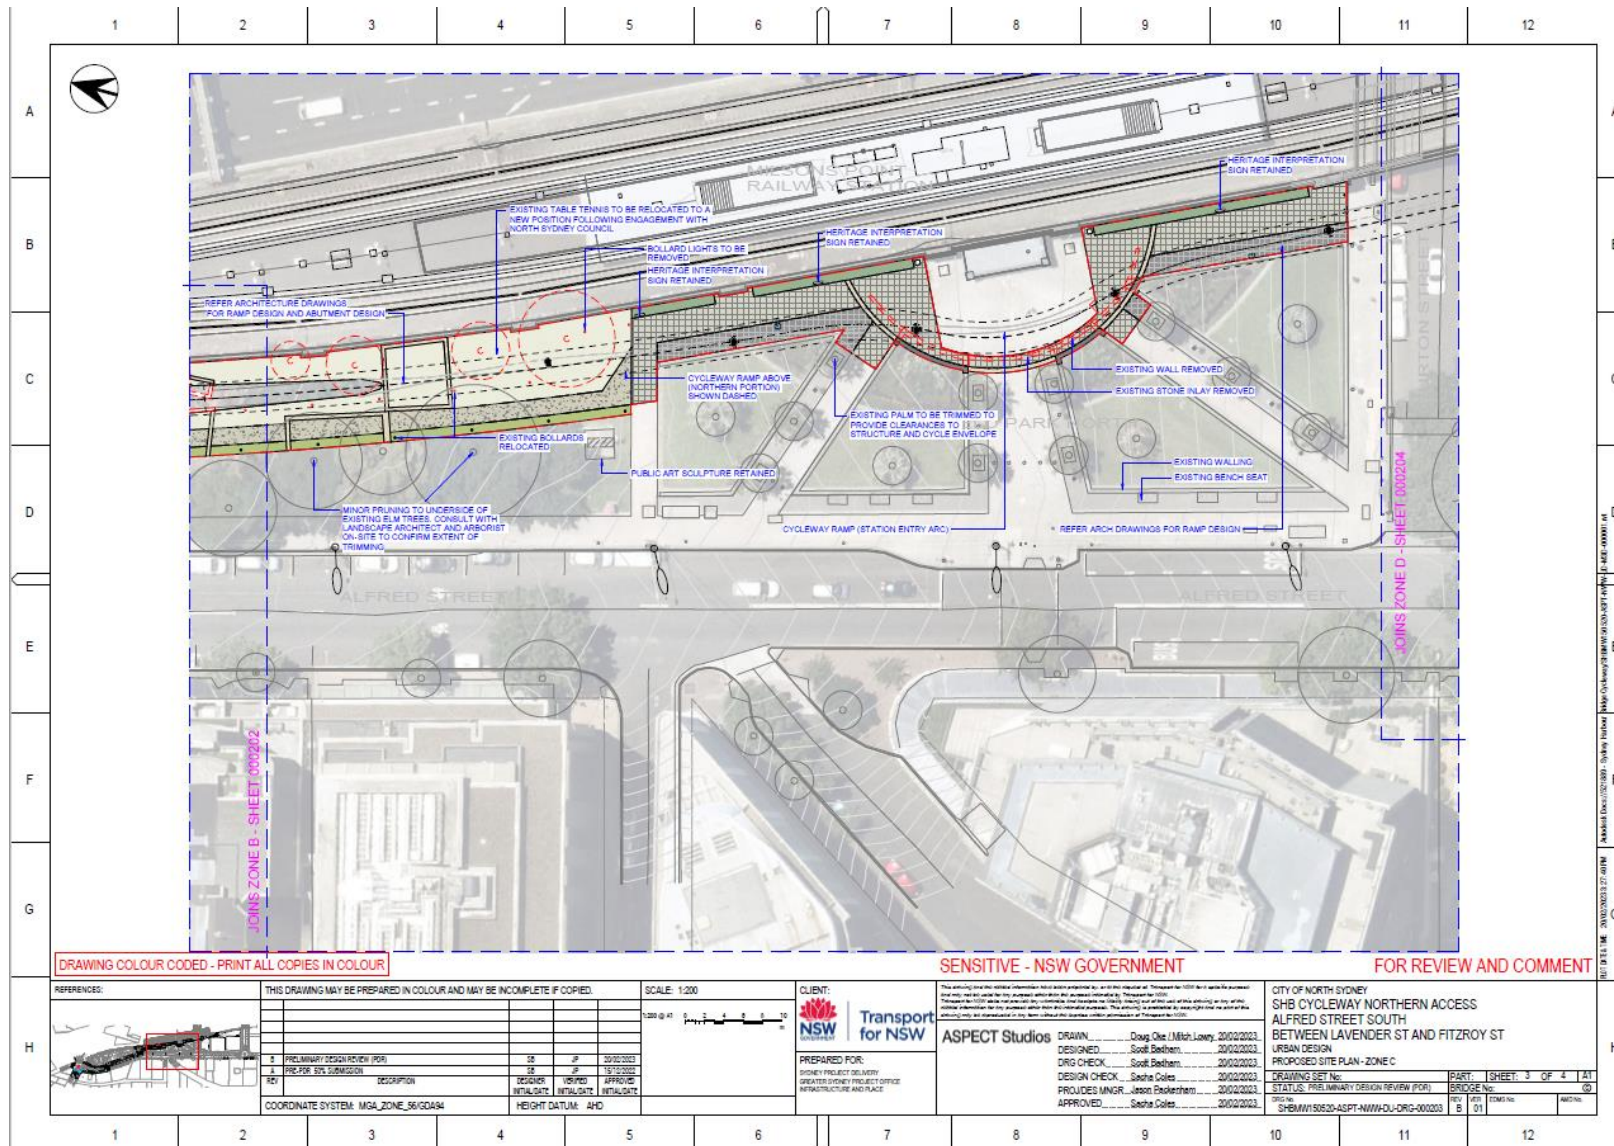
Proposed Site Plan – Zone C (Source: Aspect, 2023)
